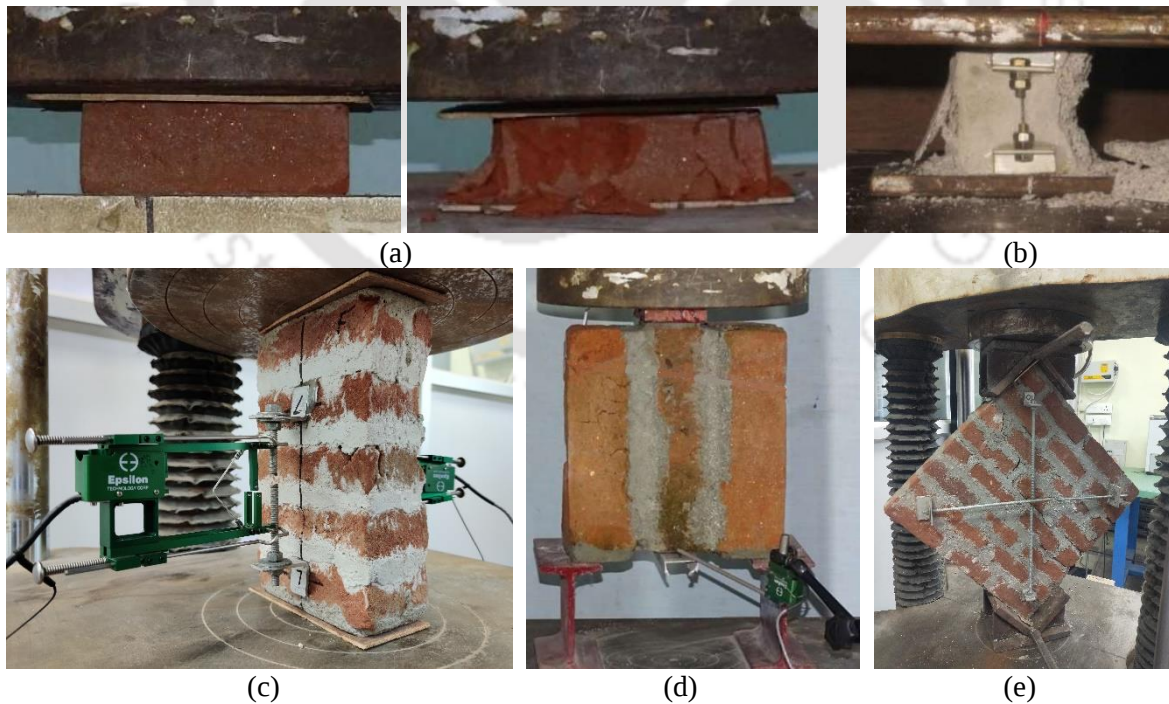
Experimental tests on: (a) clay brick units; (b) mortar cubes; (c) masonry prisms, (d) masonry triplets, and (e) masonry wallettes.
